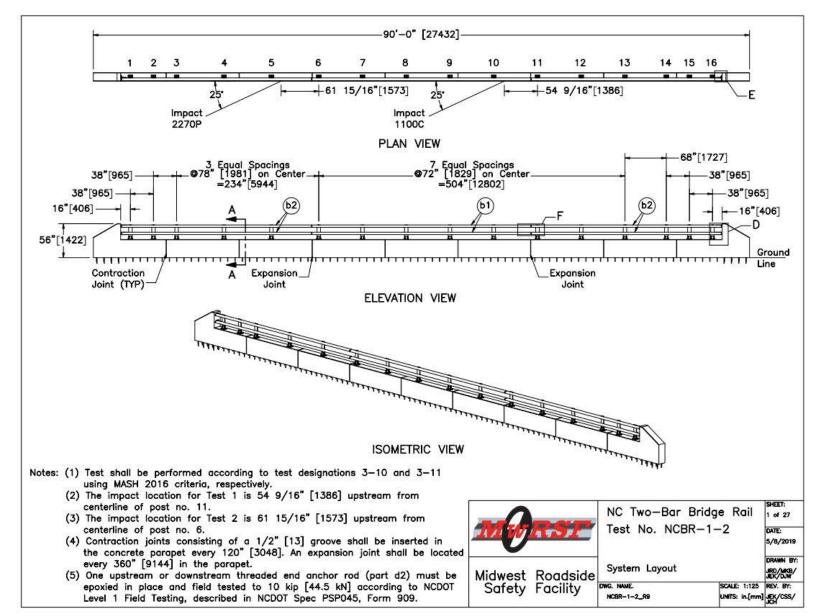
System Layout, Test Nos. NCBR-1 and NCBR-2
